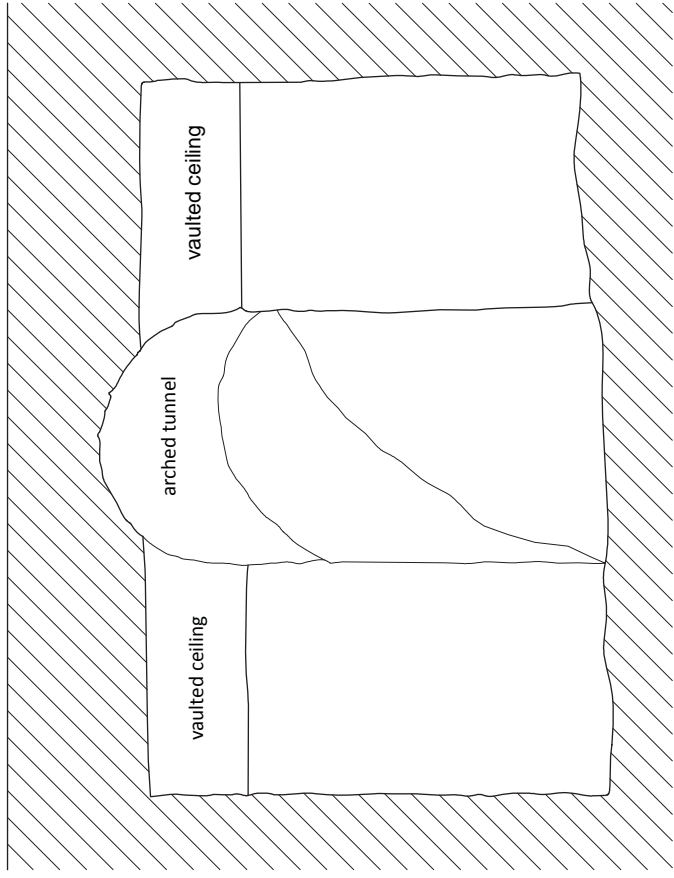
Herman Lyon's Mausoleum, topographic plan, site plan and sections
